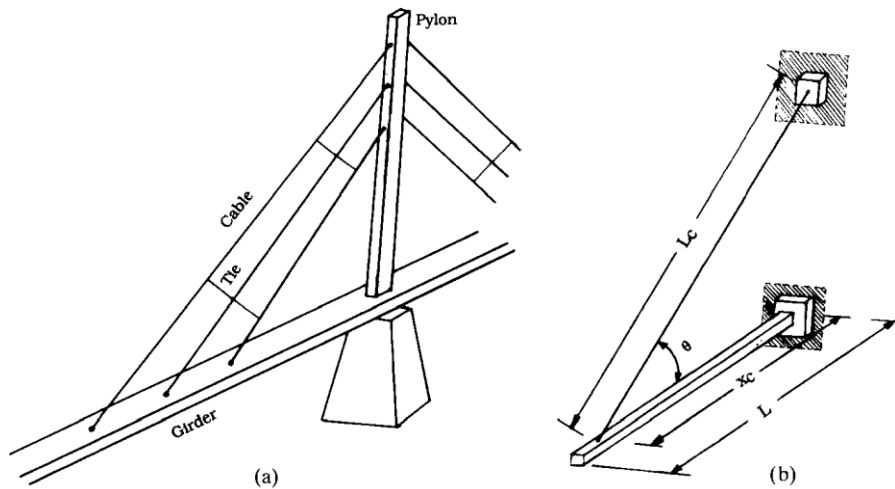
(a) Cable-stayed bridge; (b) cable-stayed beam.
